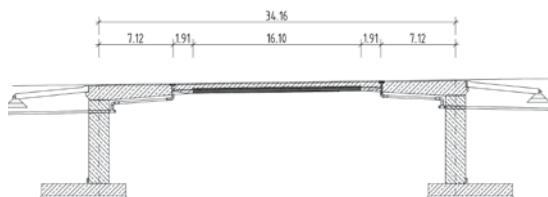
, Longitudinal section of road bridge WD-4 with VFT-WIB prefabricated elements in the area of the 2-tracked railway line
